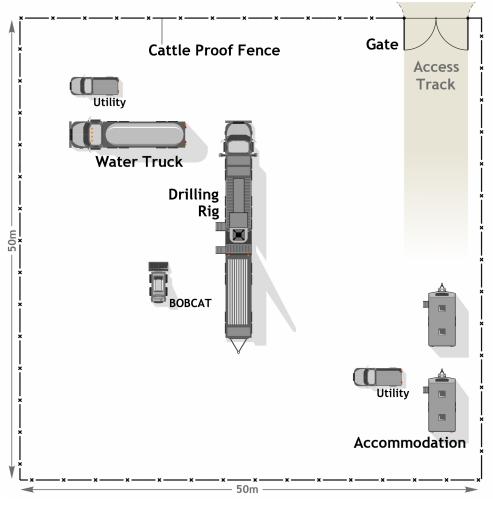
Proposed Water Bore Lease Area Layout (figures not to scale)
